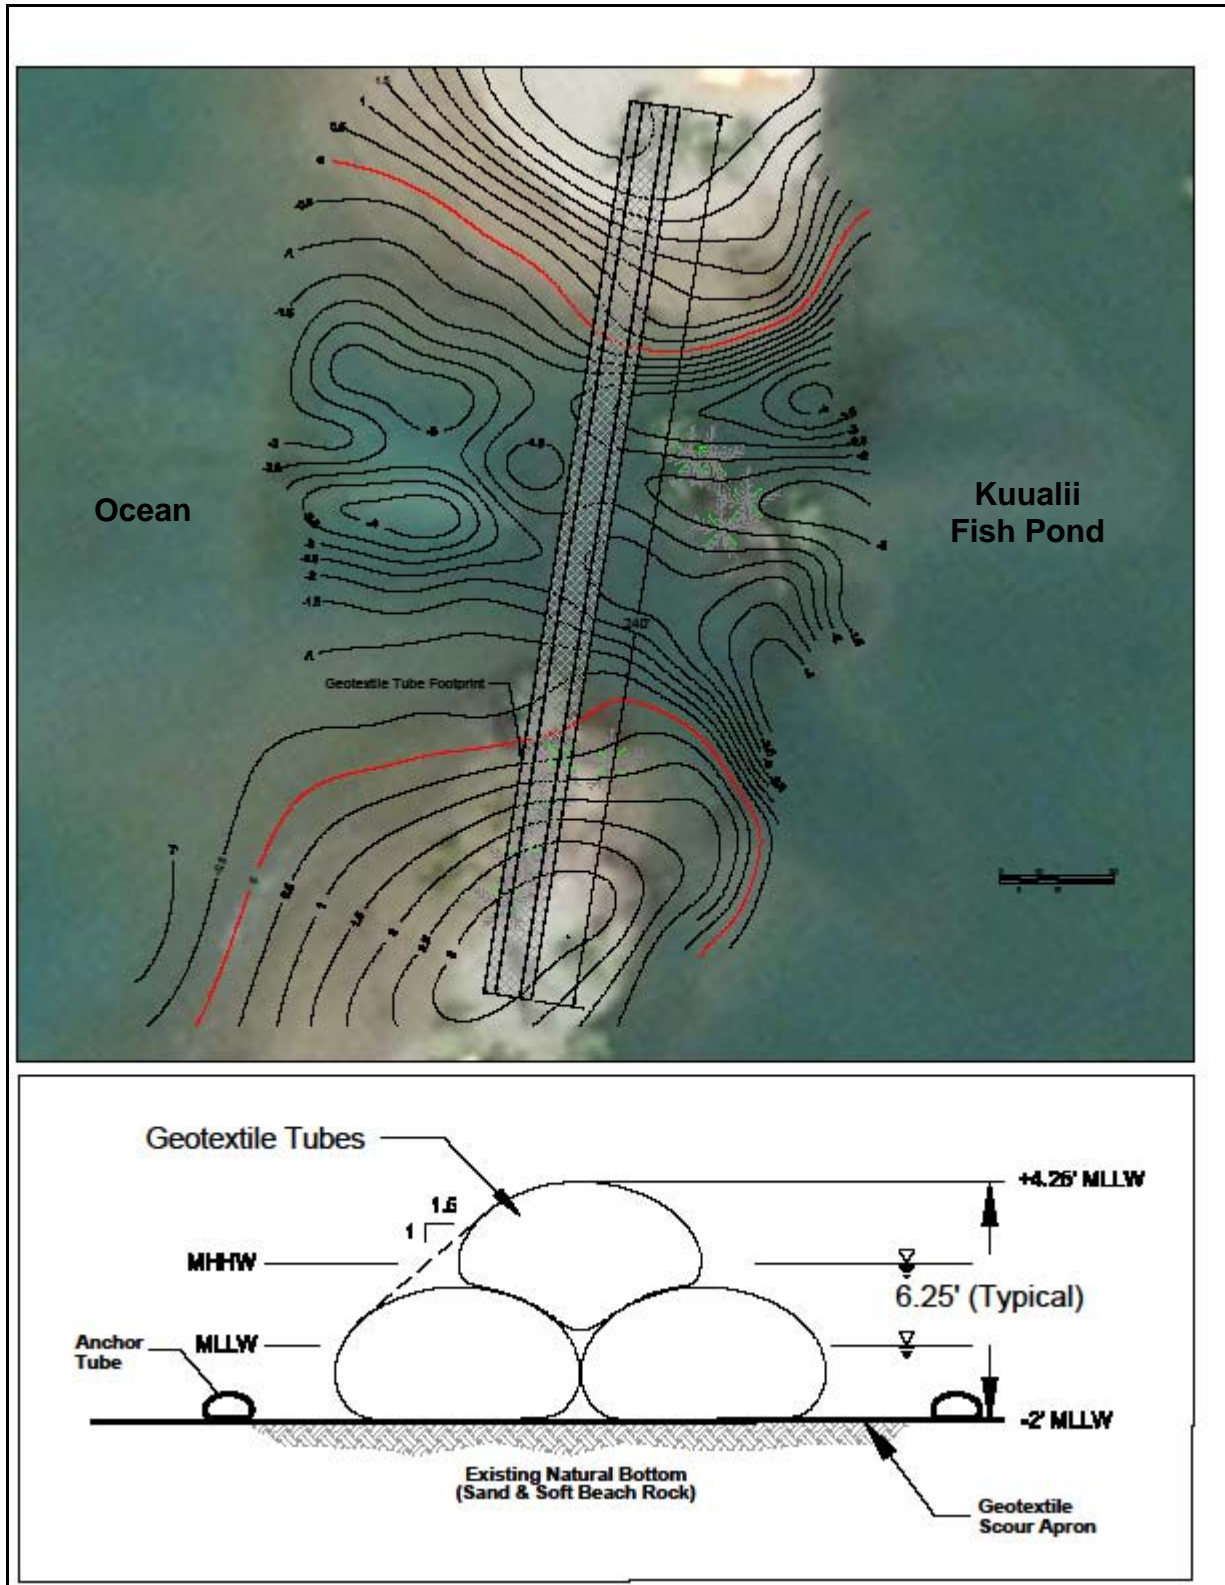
Plan View and Cross Section of Emergency Repairs
